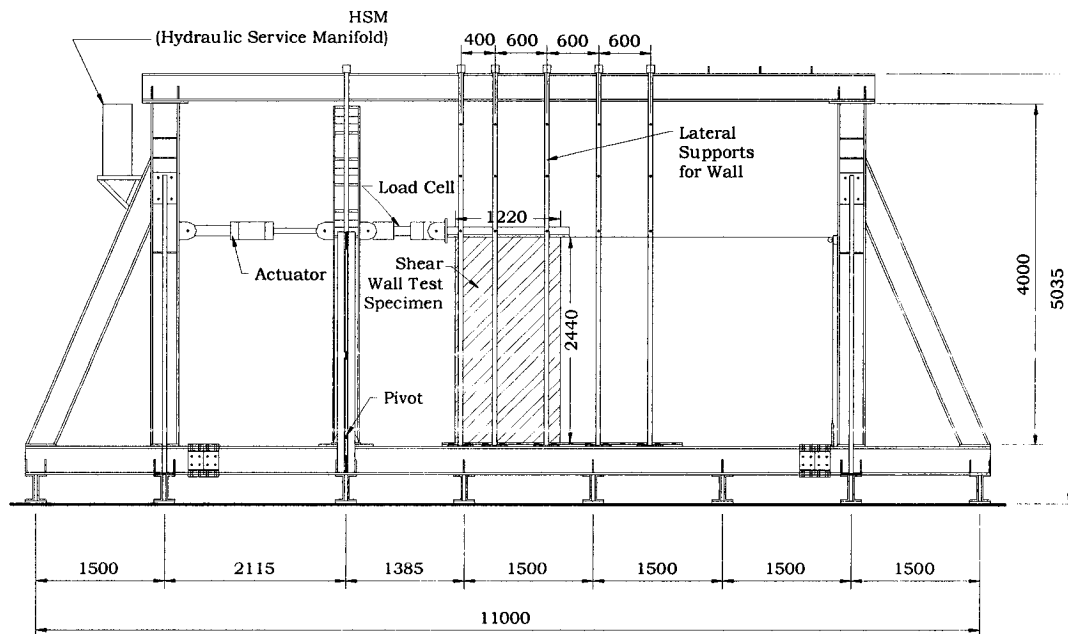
Test frame with 4' x 8' (1220 x 2440 mm) wall specimen
